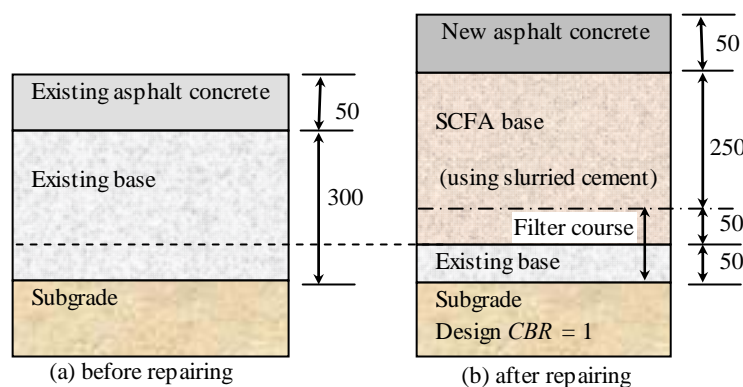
Cross section of pavement (unit: mm) ((a) before repairing, (b) after repairing).
